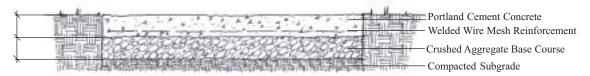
Typical Concrete Paving Section (Exact dimensions to be determined)
